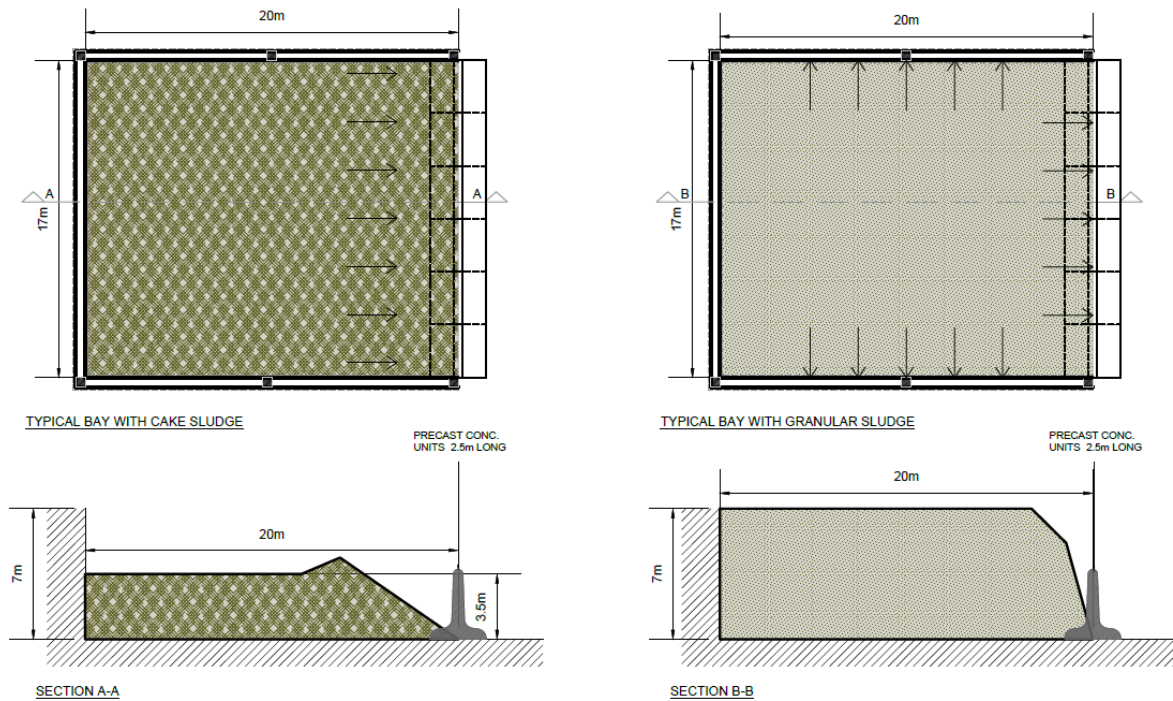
Plan of Typical Bay for Cake & Granular Sludge
